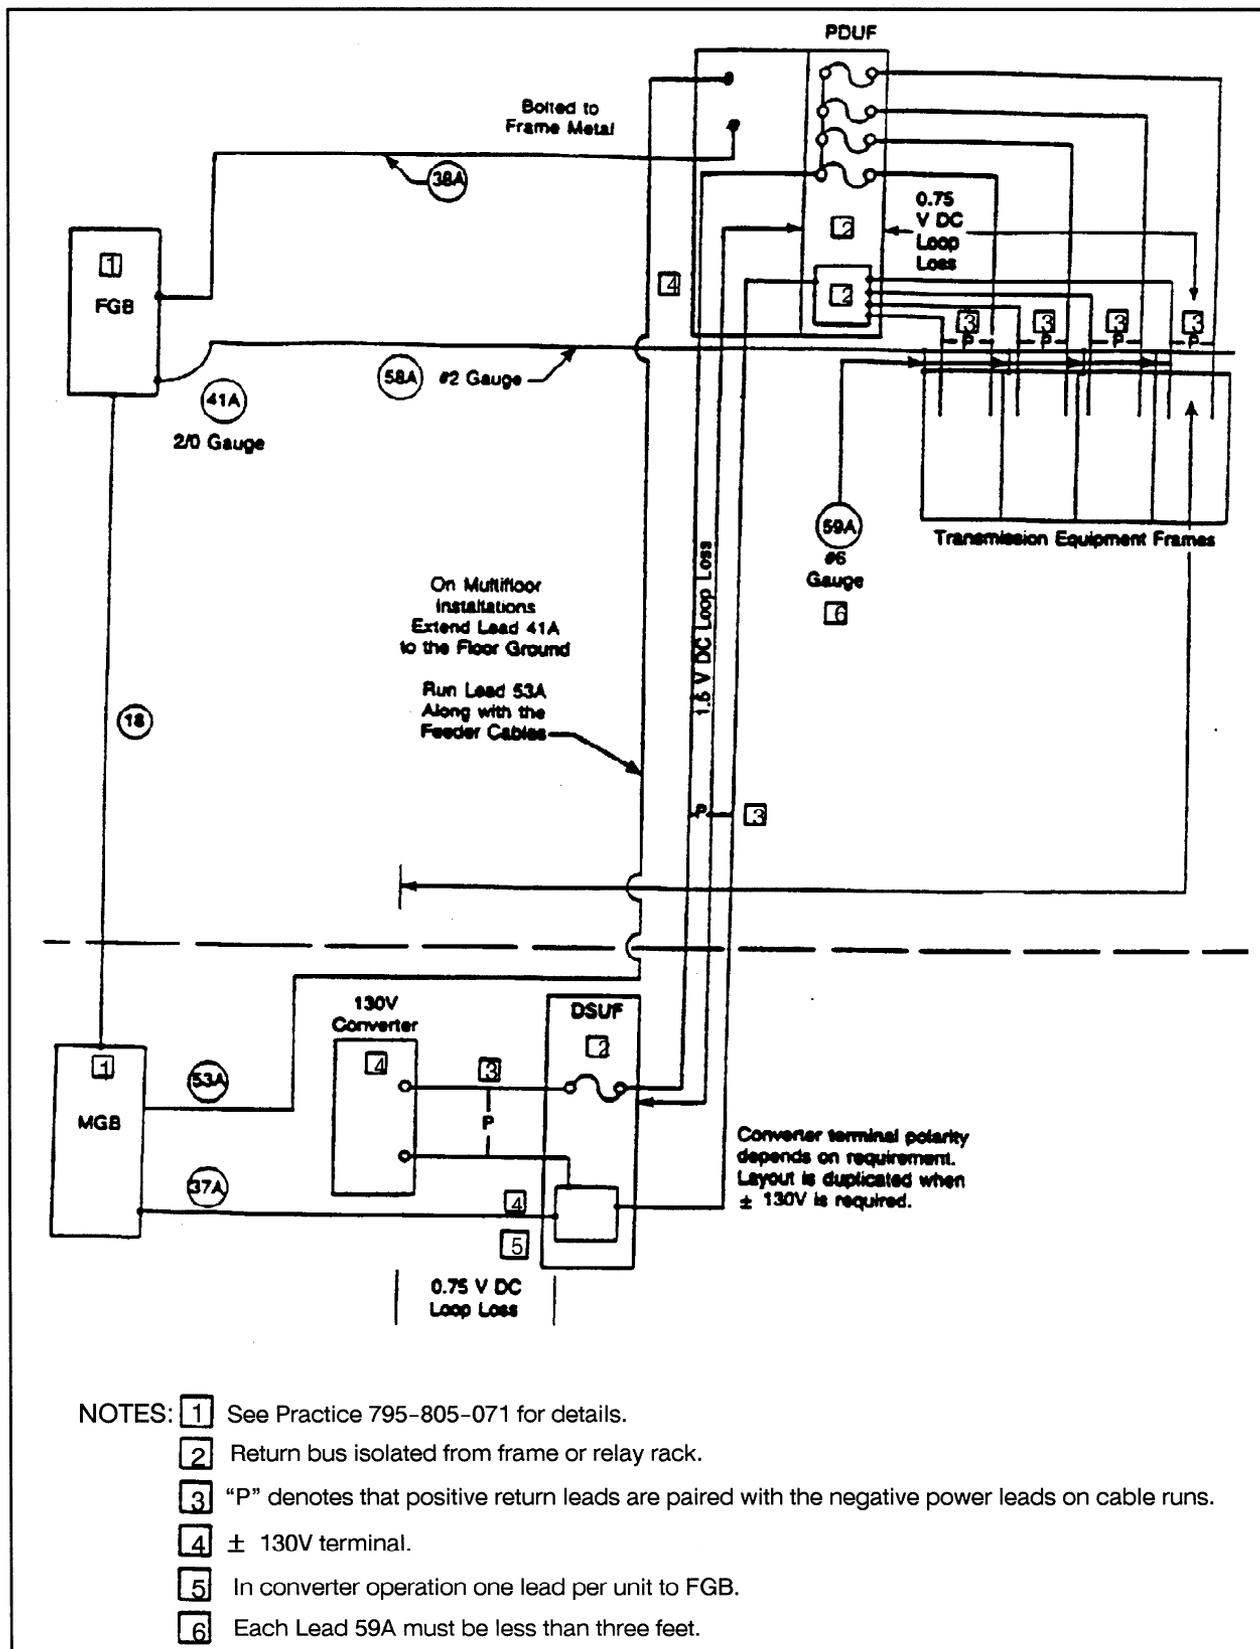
Single Point Grounding Composite ± 130 Volt Converter Wiring for Transmission Equipment on Multiple Floors
